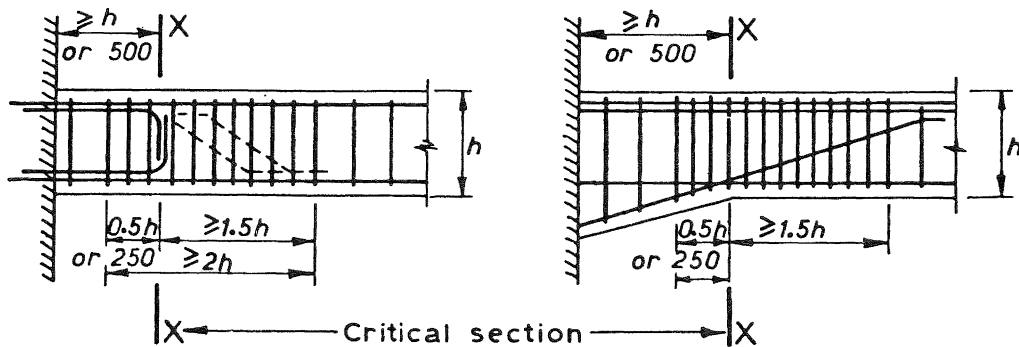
Suggested Beam Reinforcement to Locate Plastic Hinge Away from Column Face (from Commentary of NZS 3101)
